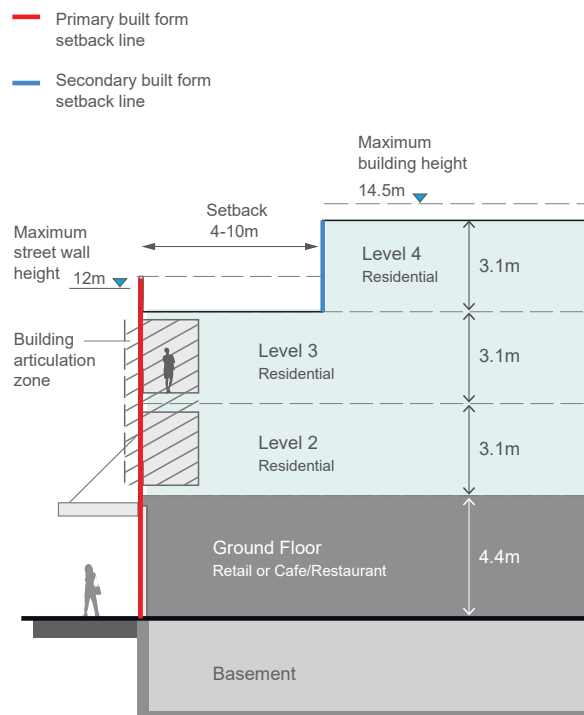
Example built form section showing street wall and floor heights, setbacks and articulation zone
